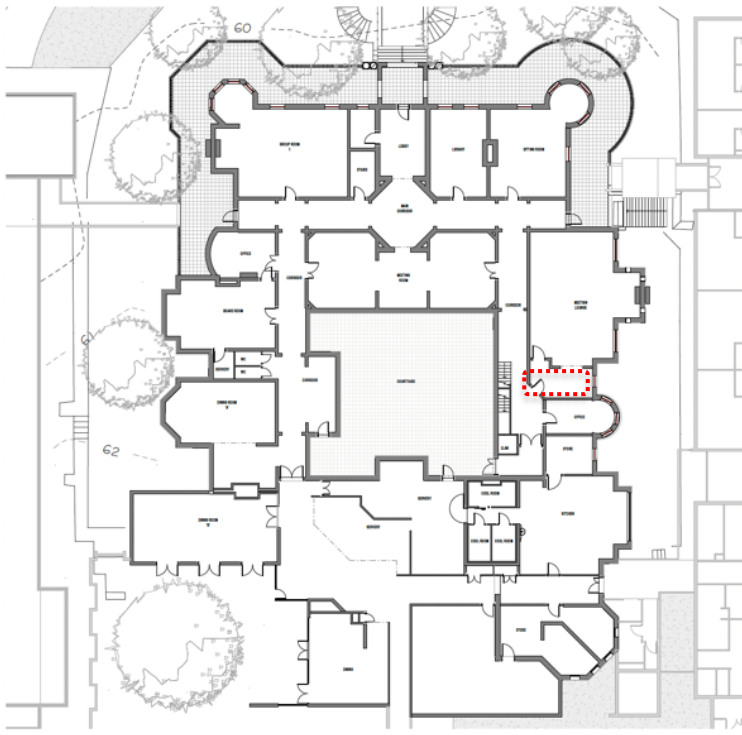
EXISTING GROUND FLOOR PLAN. Former Servery outlined in red. outlined in red.
